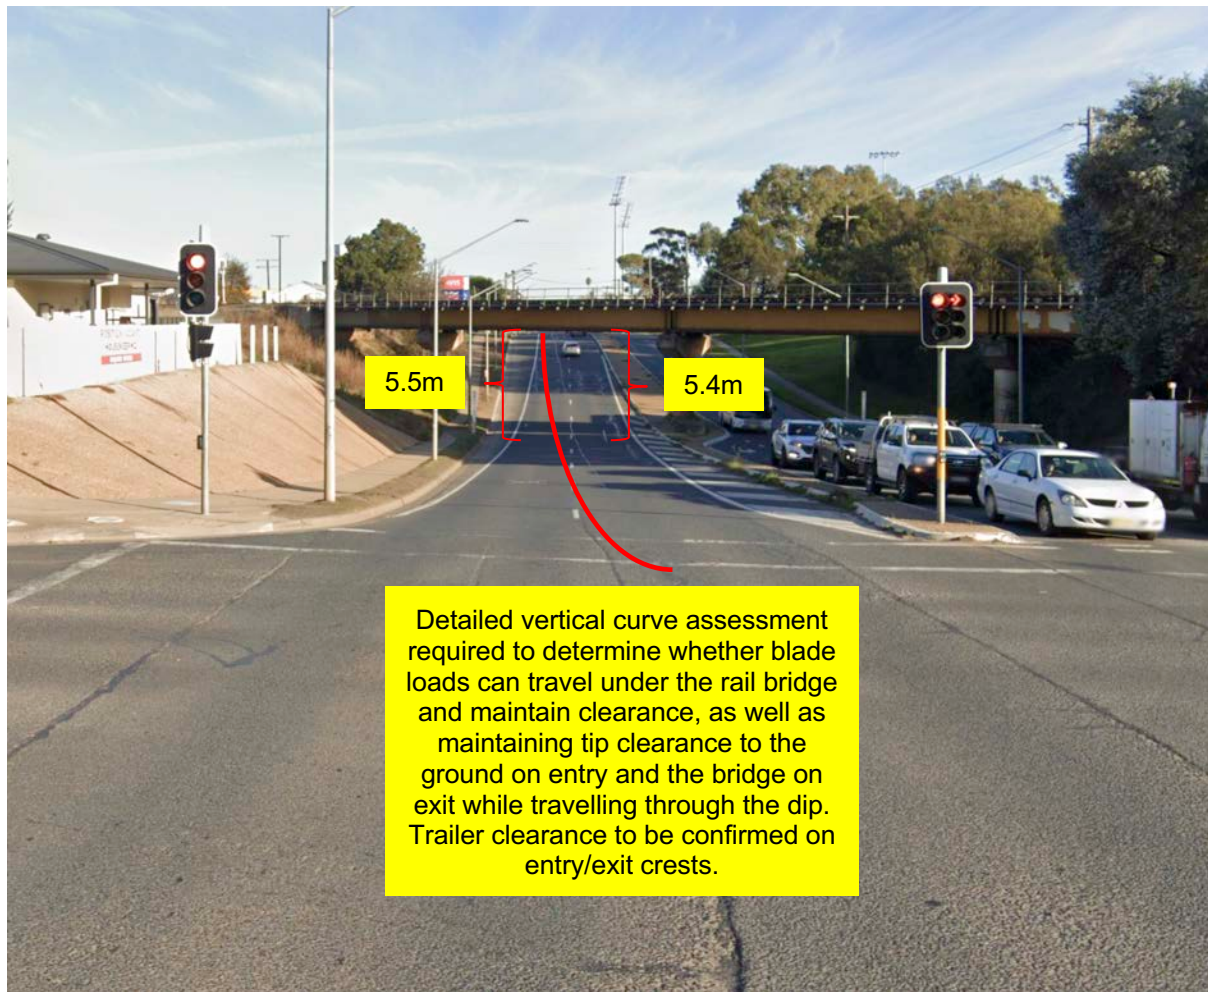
Sturt Hwy under Edward St Rail Bridge
